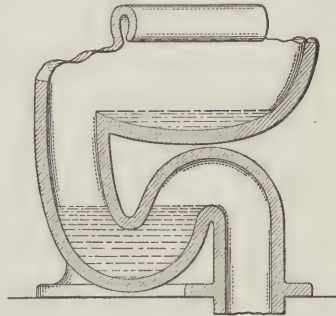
SECTION OF FRONT OUTLET WASHOUT CLOSET
